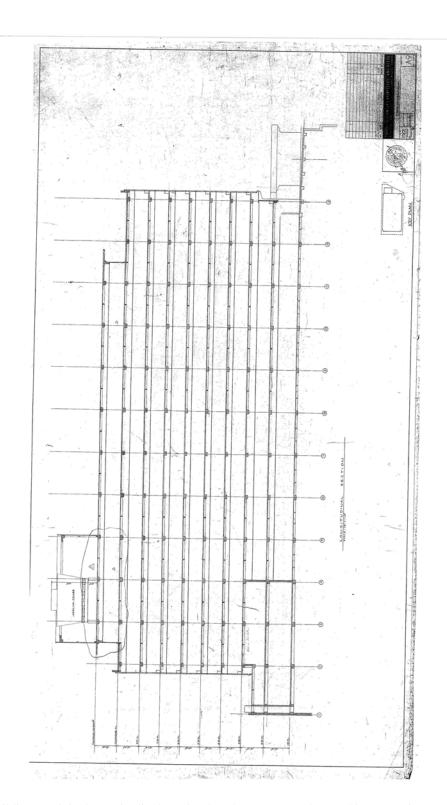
Mayflower Building - Original Longitudinal Section by Thomas E. Stanley Architects Engineers, dated May 1964.
